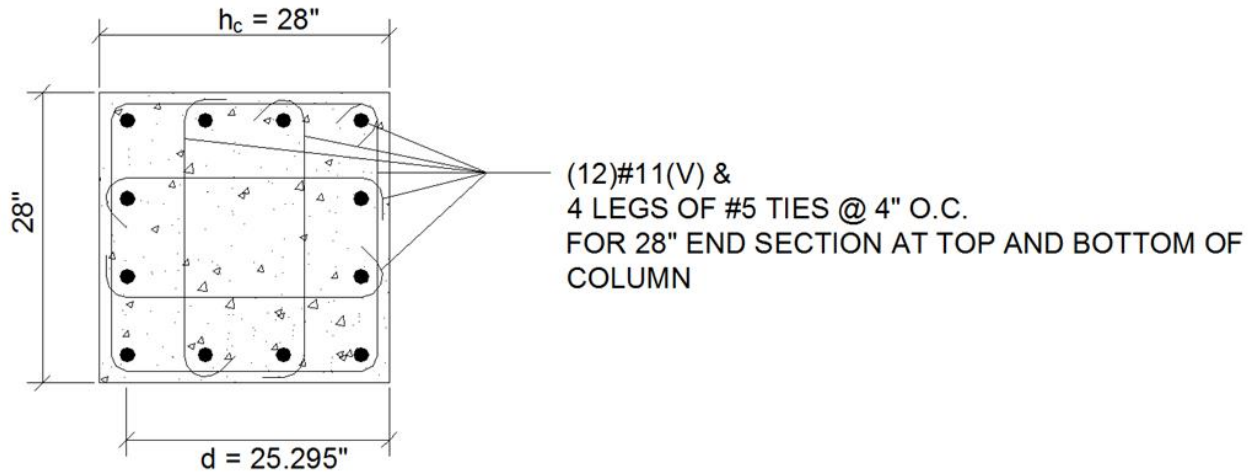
Exterior column, cross section at end section of column at the 2nd floor level based on tsunami design requirements.
